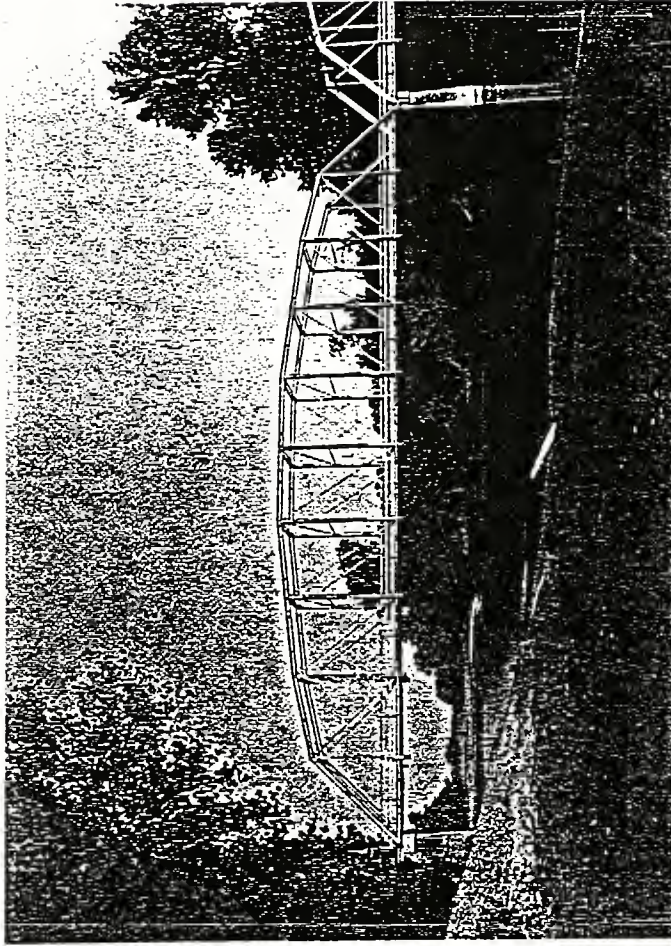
Span 3 of Bridge Structure No. 58-14-3244 facing North
